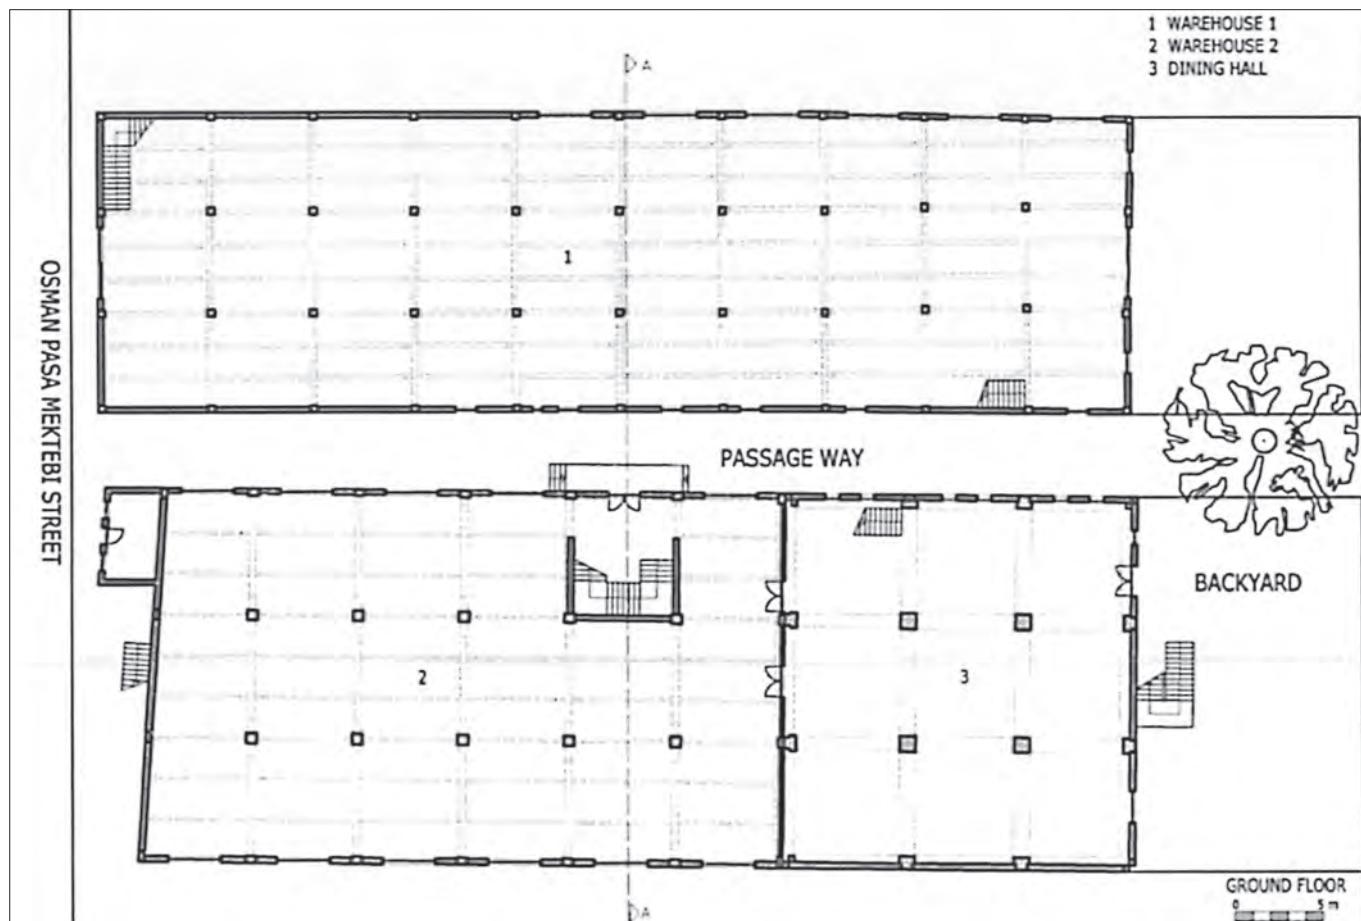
BU Campus, ground floor plan of the two warehouse buildings prior to their conversion.
